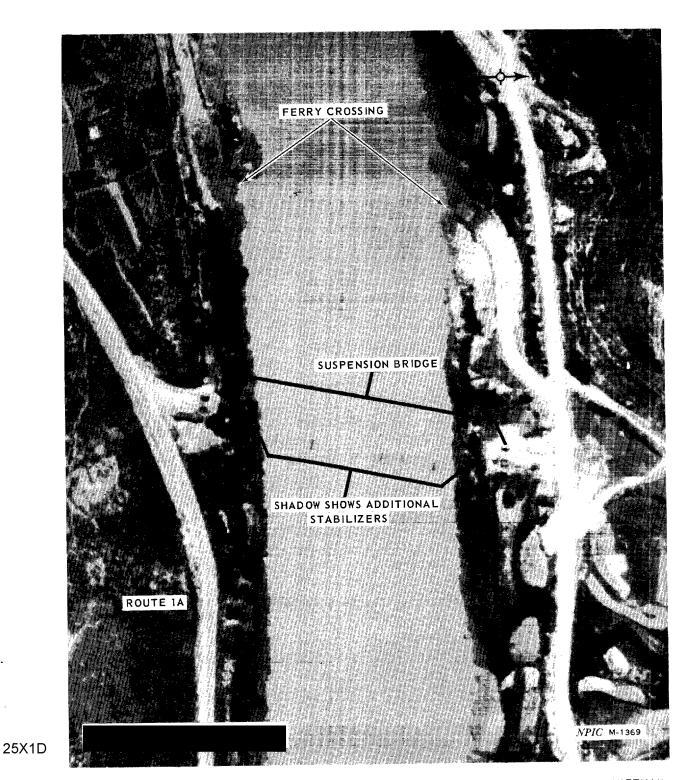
SUSPENSION CABLE BRIDGE OVER THE SONG KY CUNG, LANG SON AREA, NORTH VIETNAM
